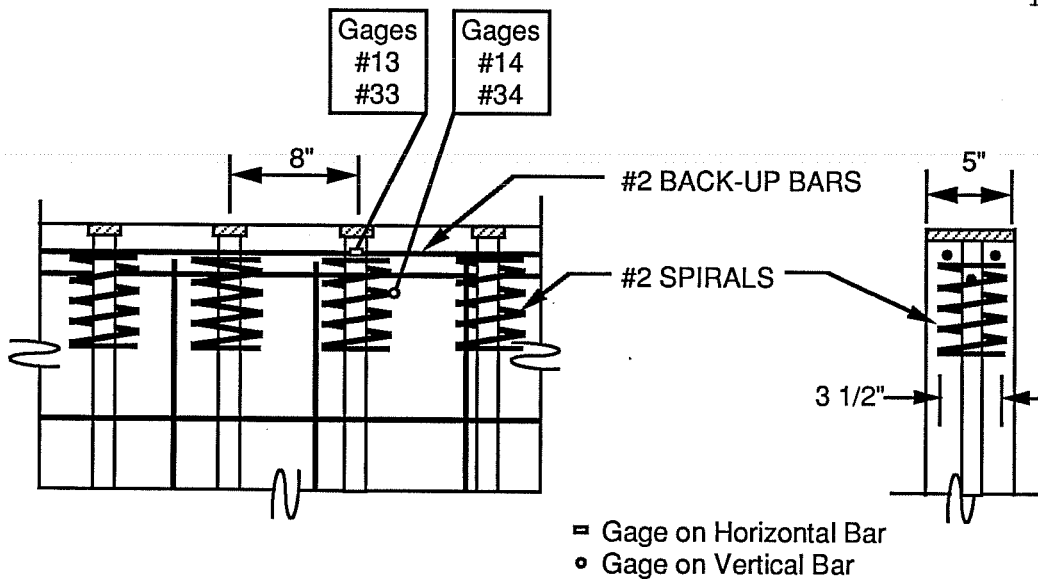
Slab #3 Spiral Detail @ Anchors I & J
